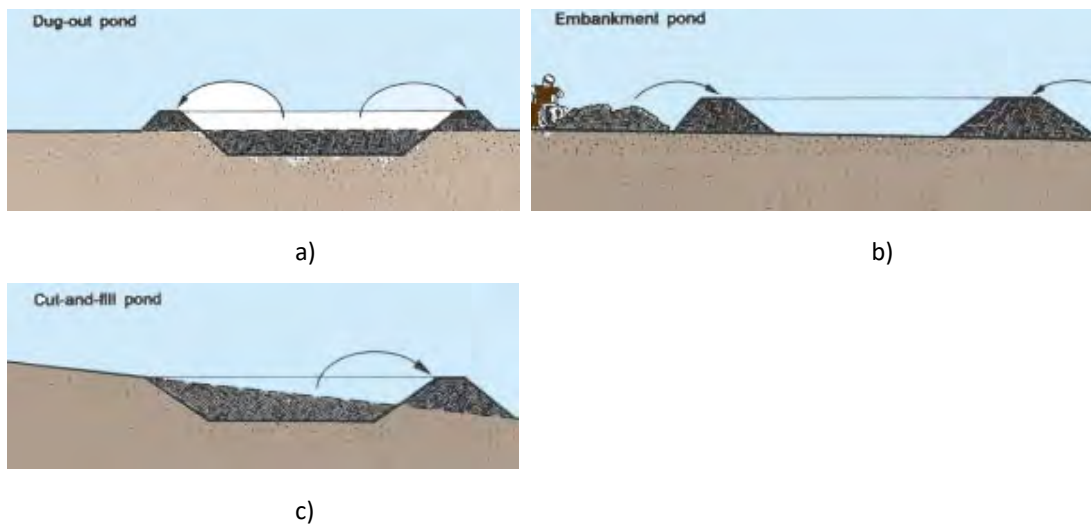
Pond types based on construction methods: a) dug-out pond, b) embankment pond and c) cut- and-fill pond. Source: FAO.
